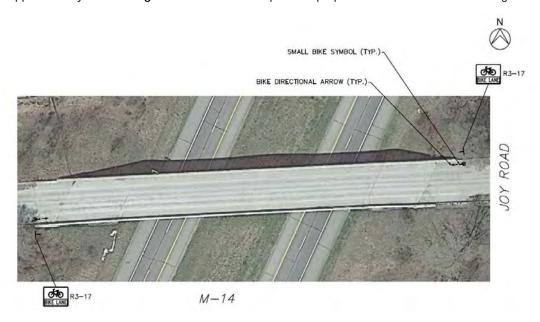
Proposed Bike Lanes at Joy Road Crossing M-14
